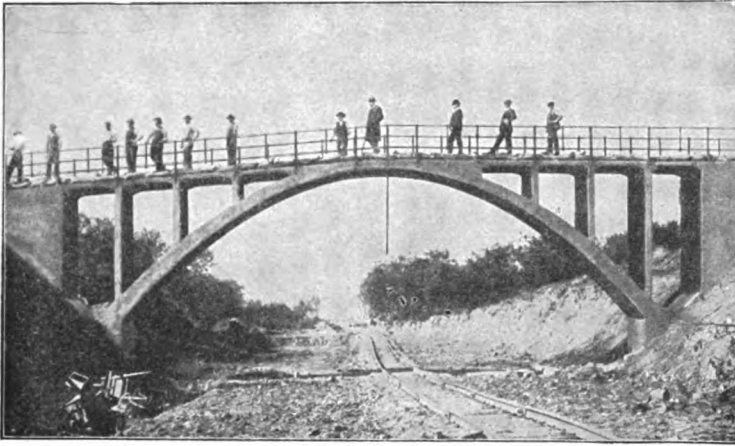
Foot bridge over the Metz-Vigy Line. Test load.
